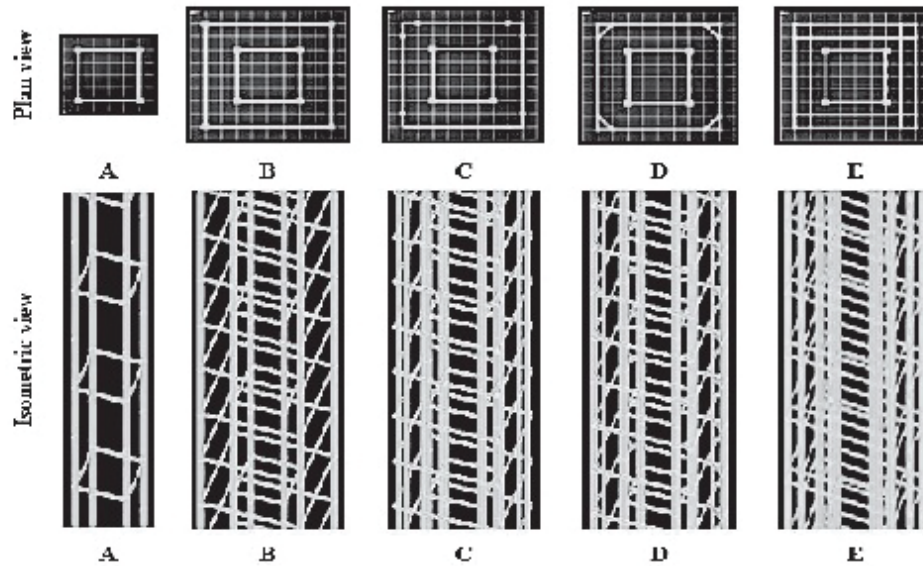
ANSYS Models of Columns (Plan and Isometric View)
